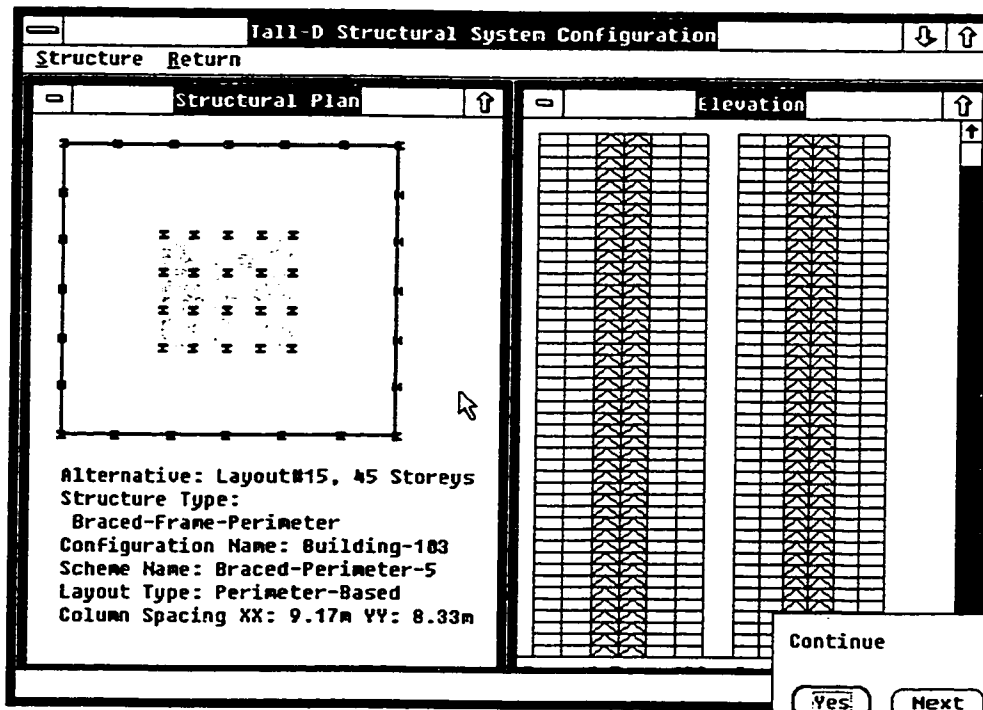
8 Steel braced-frame (on perimeter) structural system alternative for Layout#15: Perimeter column spacing 9.17m and 8.33m
